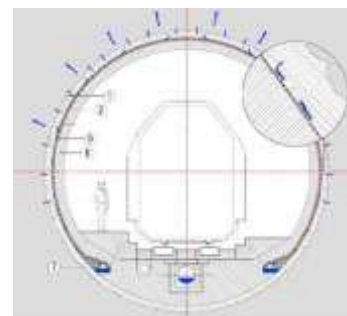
Detail of tunnel wall showing rock (1), porous concrete (2), waterproofing (5), concrete liner (6), Drainage pipes leading water out of tunnel(7).
